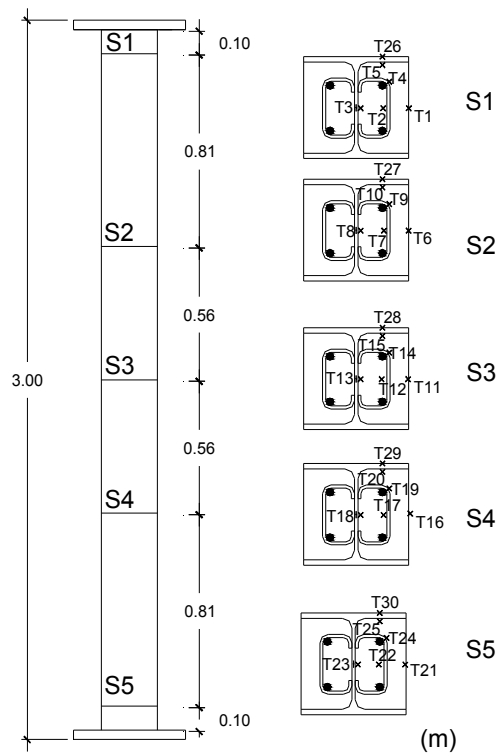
Composite steel-concrete specimen with position of thermocouples
